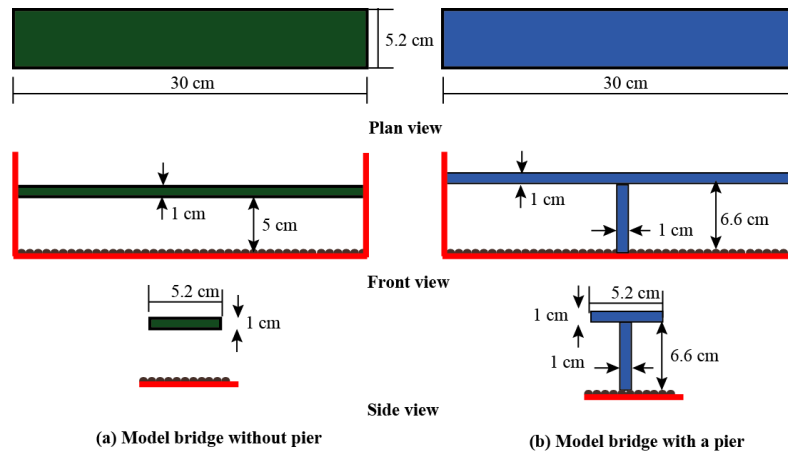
(a) model bridge without pier; (b) model bridge with a pier.
